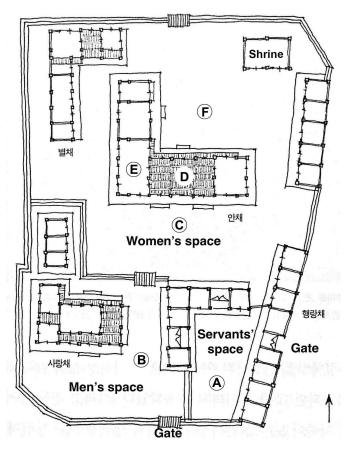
A Scholar's House. Kyusul Han's House Plan, built in 1890s. 2014. Redrawn by Keunhye Lee (Source: www.cha.go.kr)
